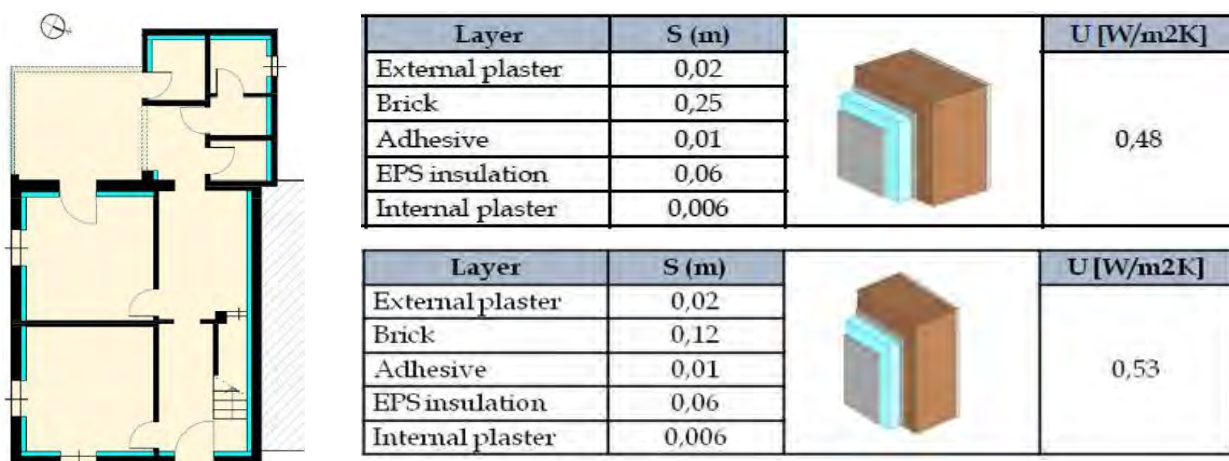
House floor plan with internal insulation (left). Material layers of the insulated walls (right)
